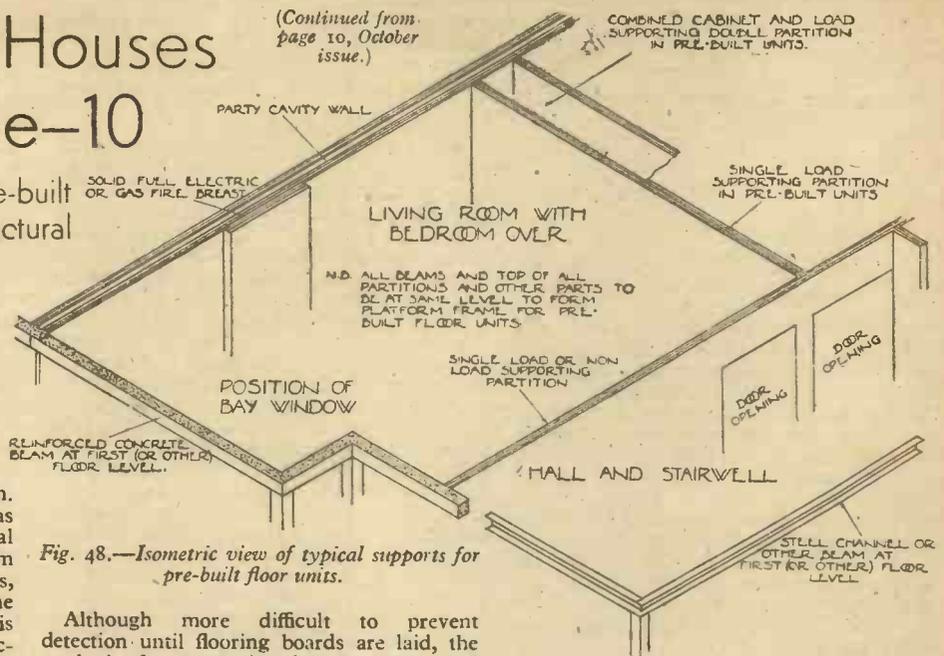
Isometric view of typical supports for pre-built floor units.
